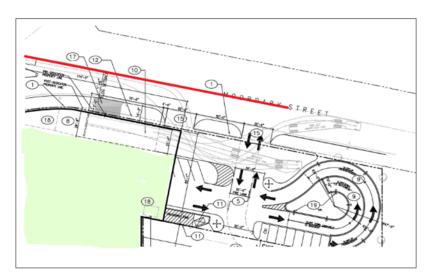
Figure C: Moorpark Street's new parking entrance (entrance at point 15) with a dark line indicating a proposed barrier
